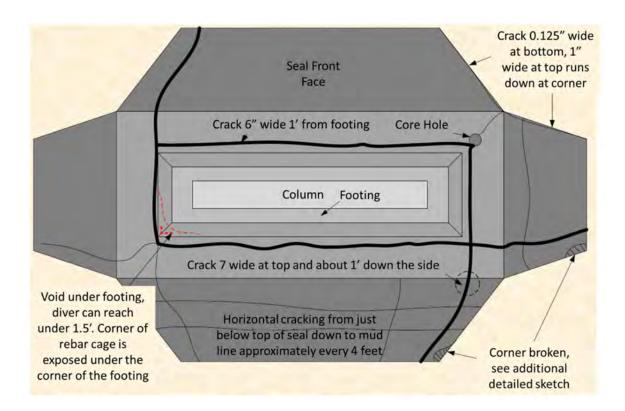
Plan view of seal footing with cracks due to DEF (McCall 2013)
